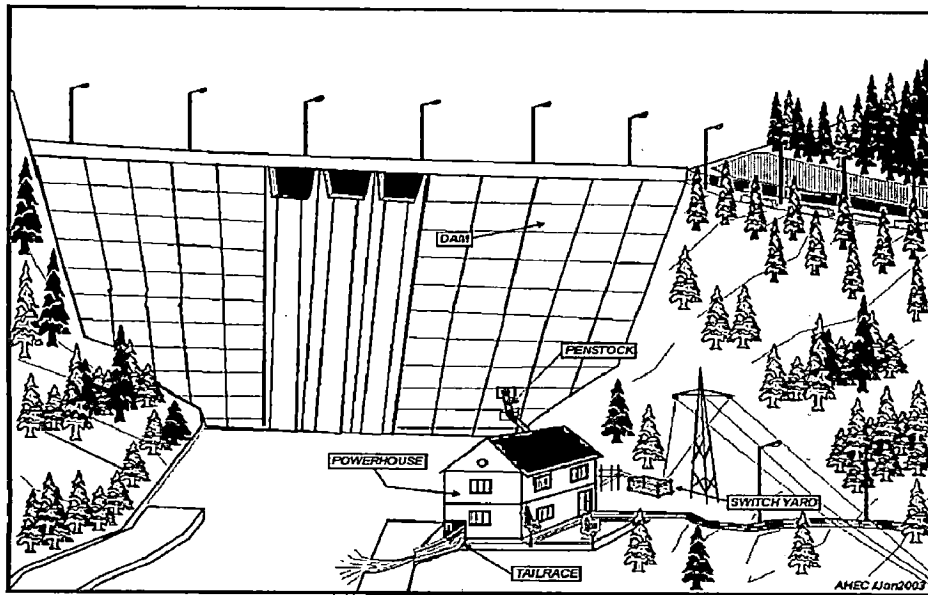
Typical Arrangement of Dam Toe Scheme
